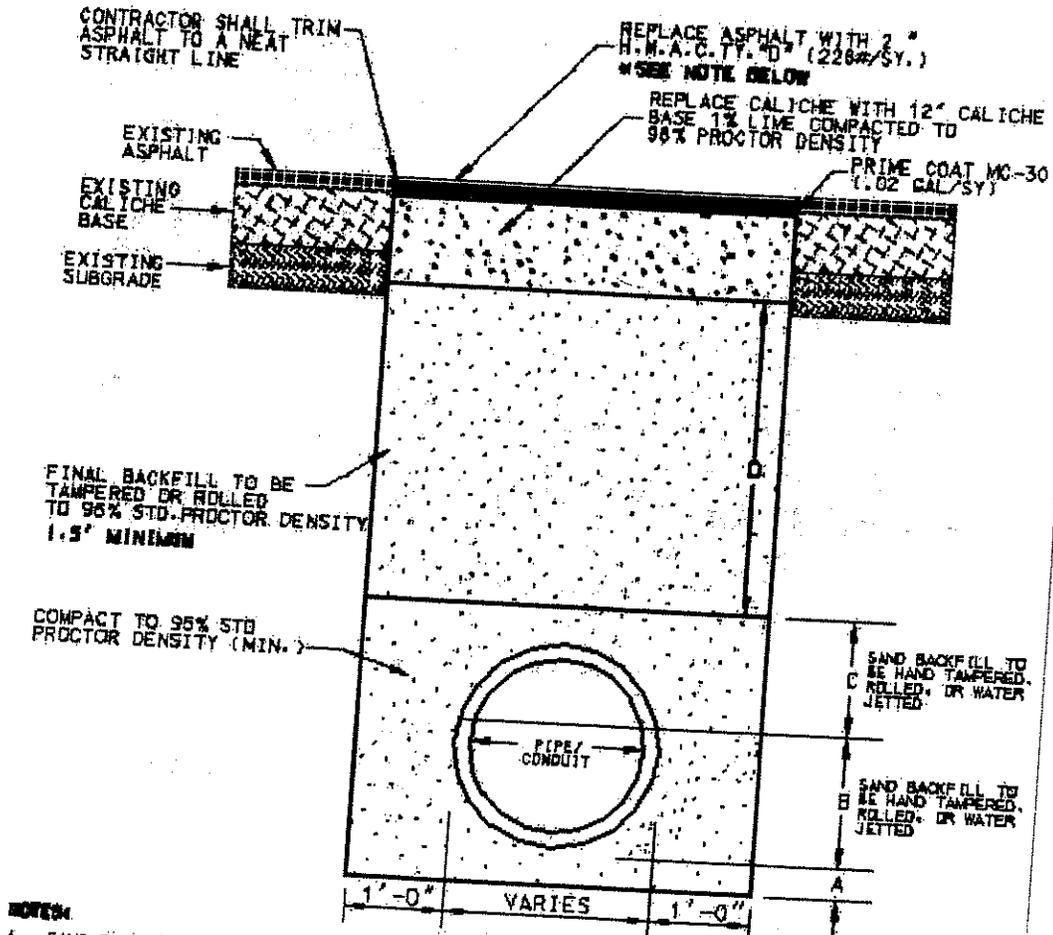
Exhibit N Backfill and Excavation Standard Street Pipe Bedding
